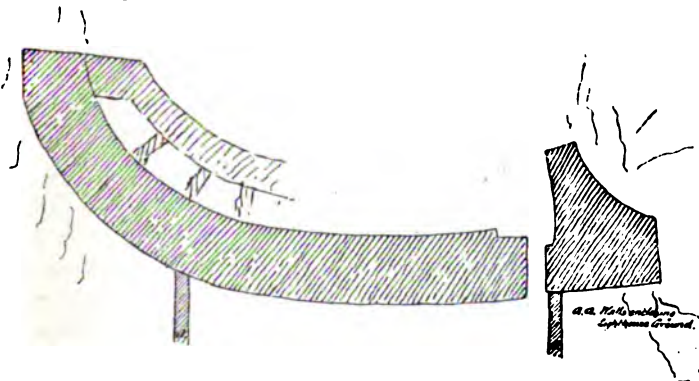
Ground-plan of Wall of Dun Stron Duin, Bernera, showing Entrance, and Gallery in thickness of wall. (Scale 20 feet to 1 inch.)
